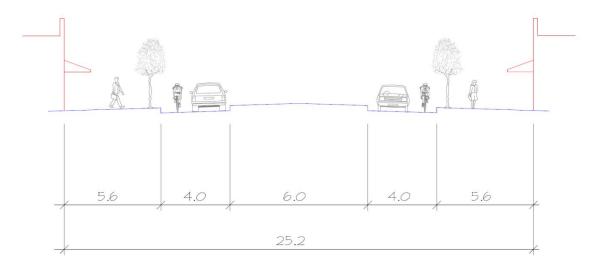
Proposed Cross Section for the Main North South Spine Road (Honeywood Avenue extension)
